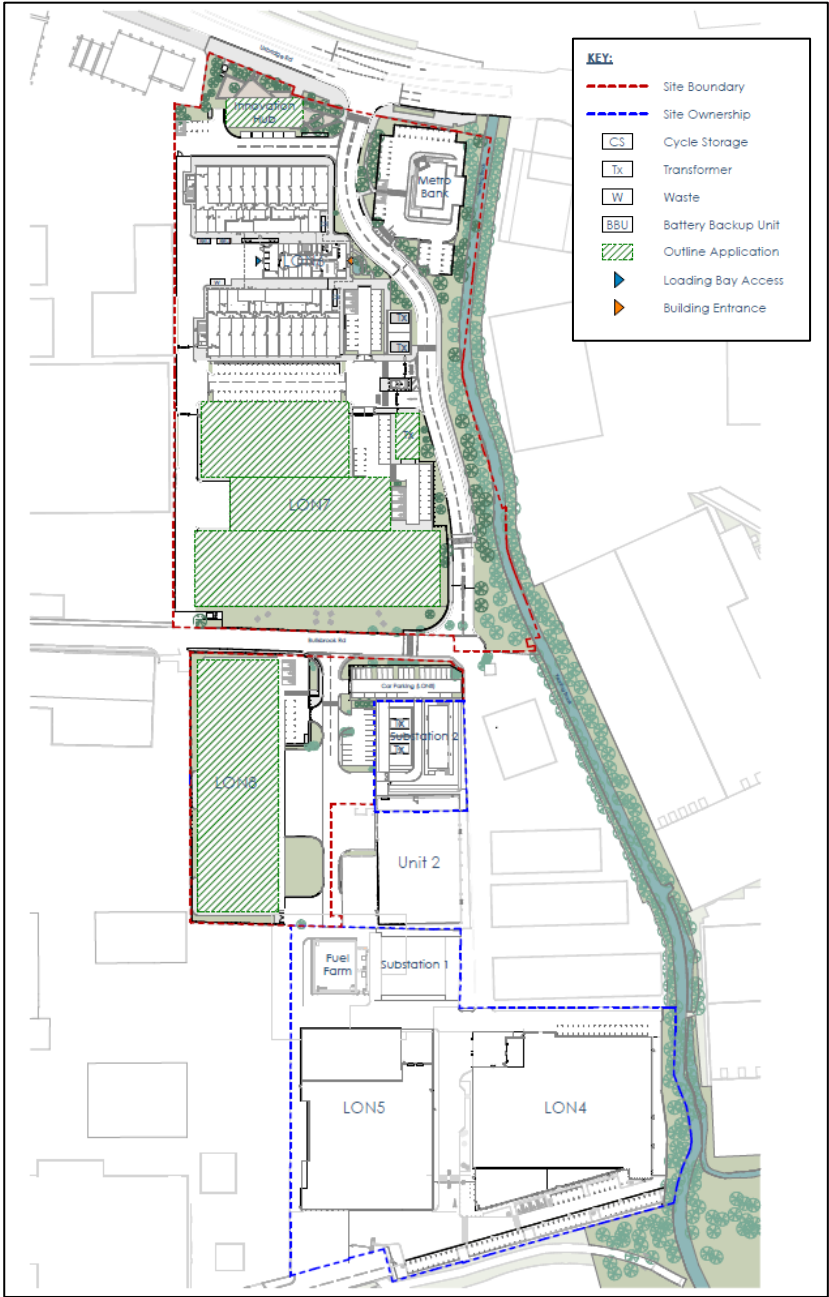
Hybrid application drawing, LON6 detailed, LON7 and LON8 outline
